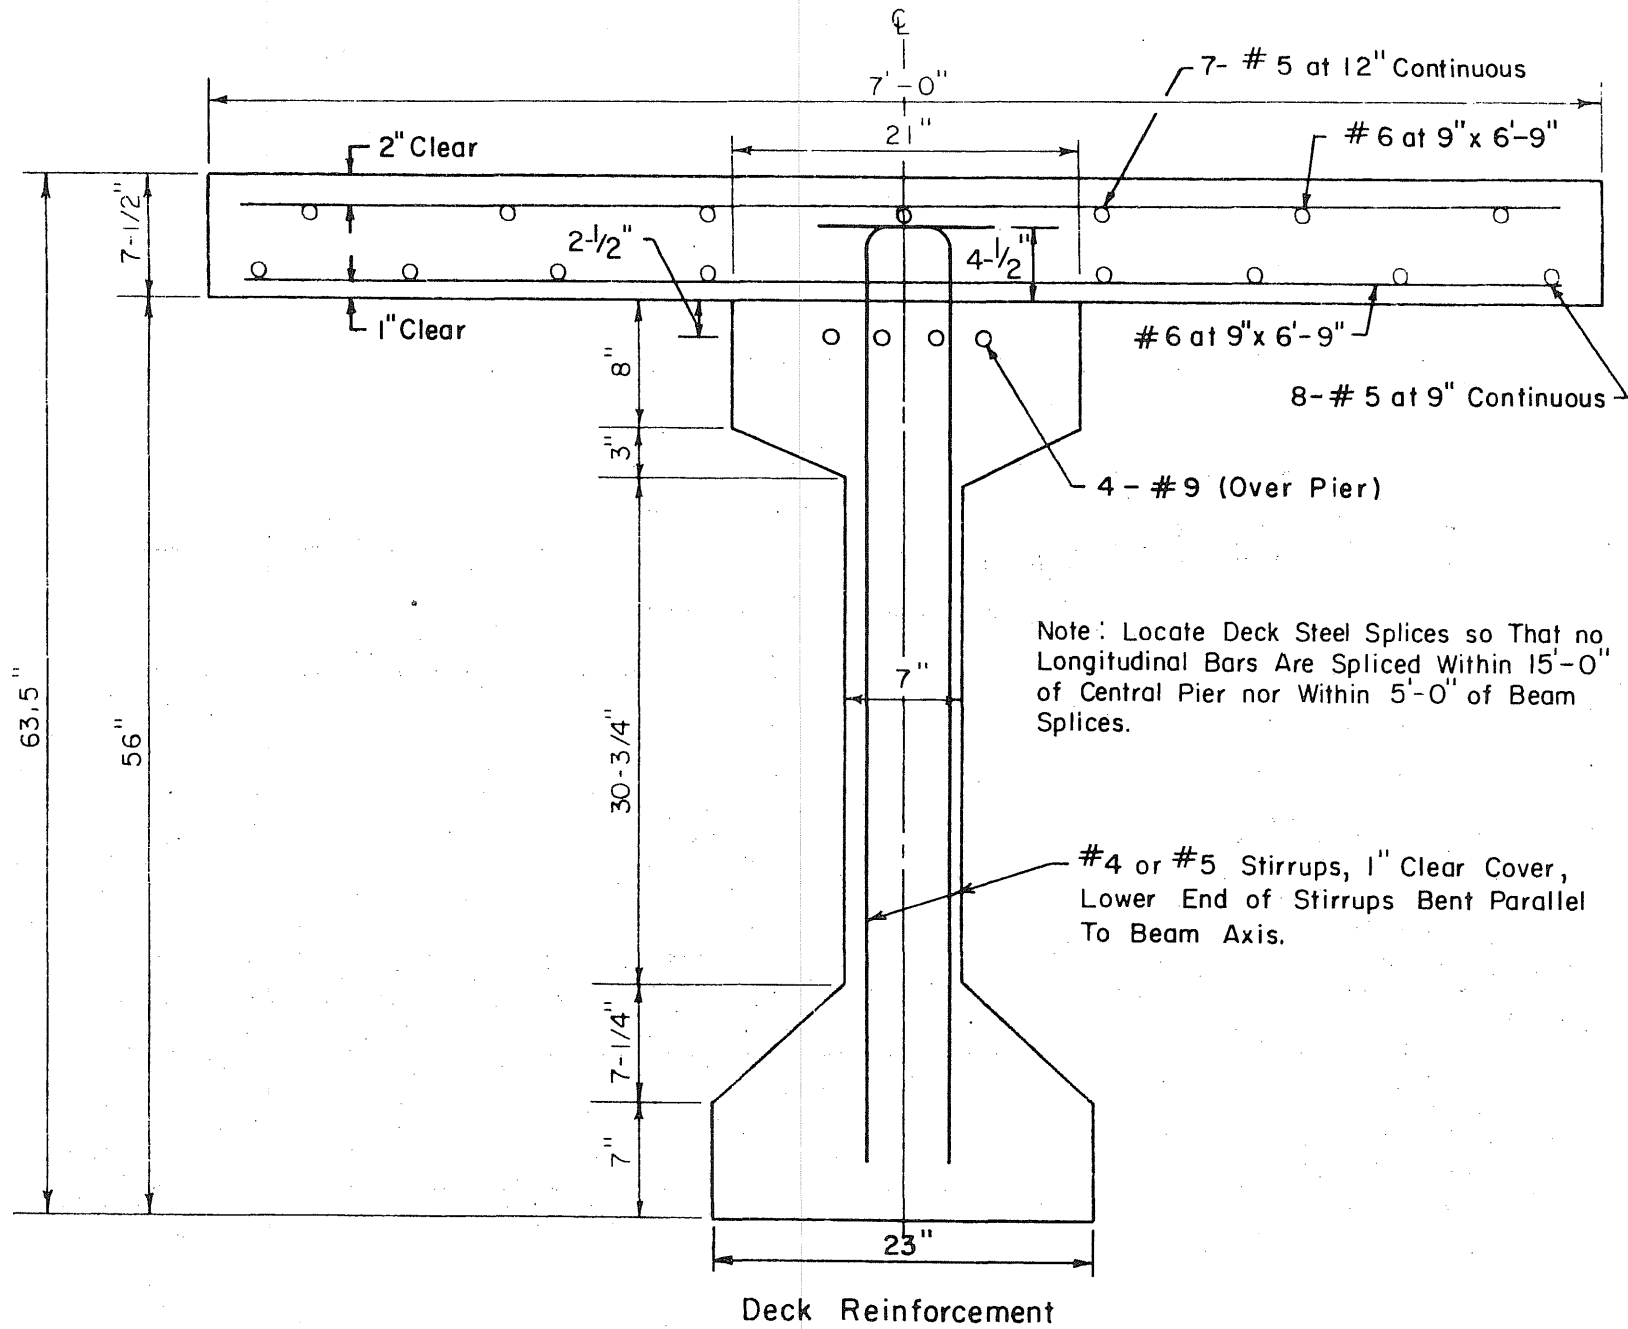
ARRANGEMENT OF REINFORCEMENT IN DECK
